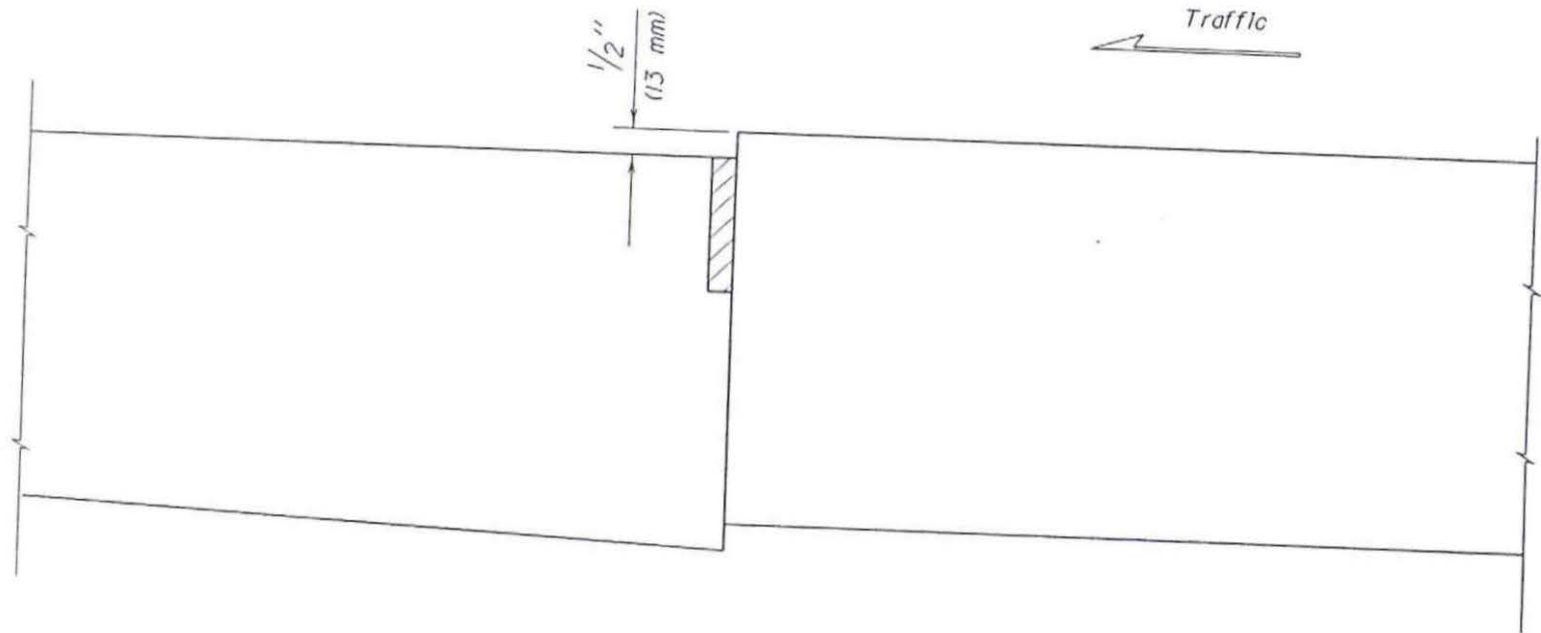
Inspection of SFRC Pavement (Detail "X")
